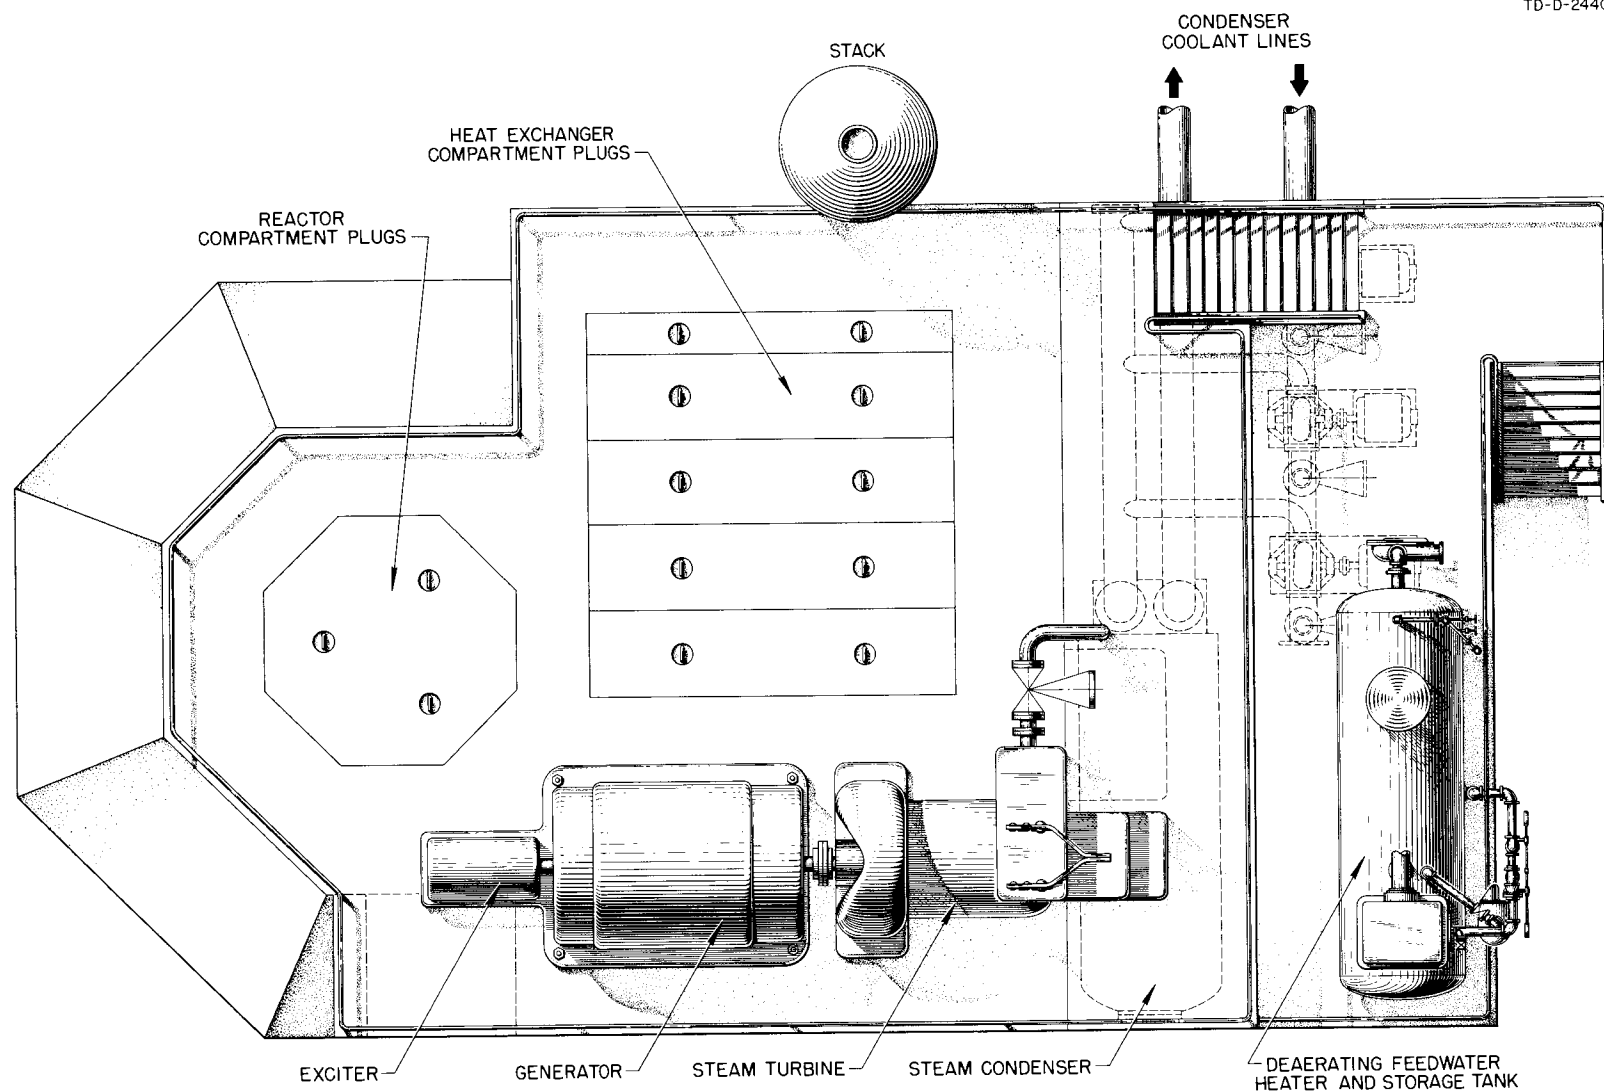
Steam and Auxiliary Equipment, Plan View.
